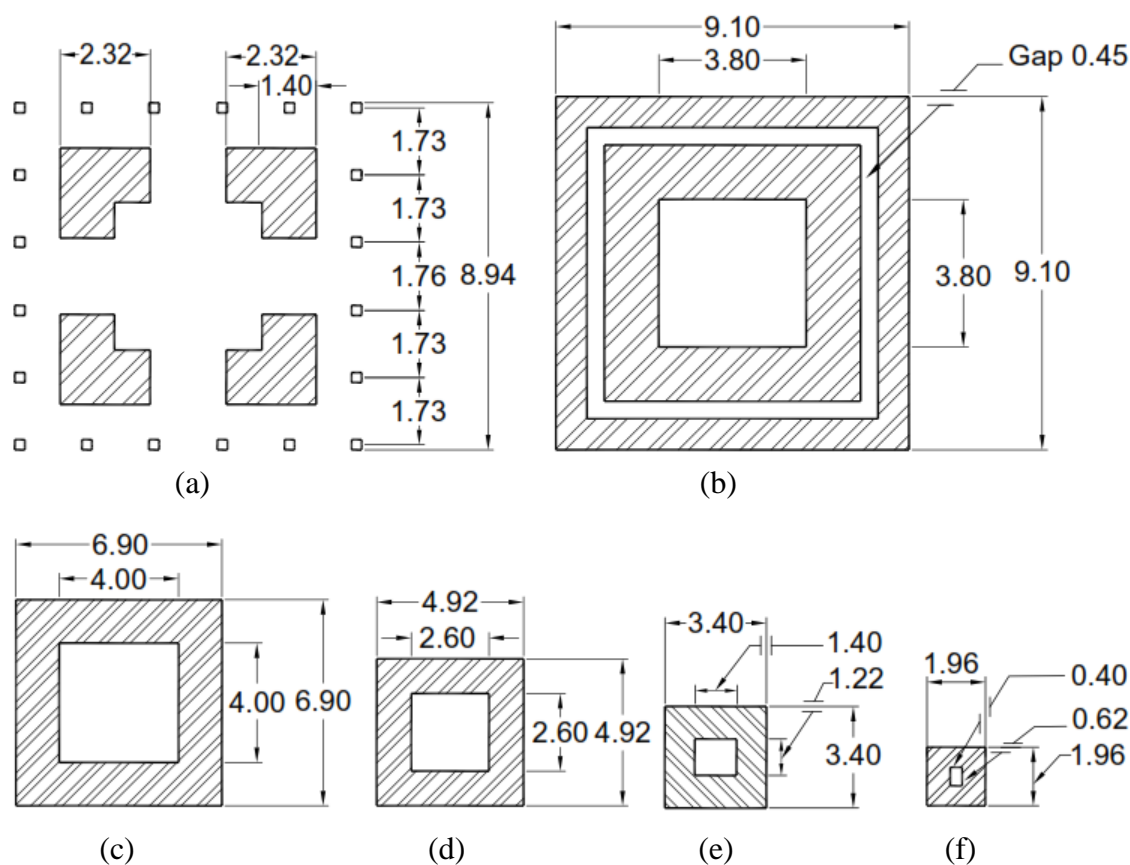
Typical FEM cross-section floor of Nyatapola temple, all dimensions in (m): (a) first floor at base [L1a], (b) first floor at 3.12 m [L1b], (c) second floor [L2], (d) third floor [L3], (e) fourth floor [L4], and (f) fifth floor [L5].
